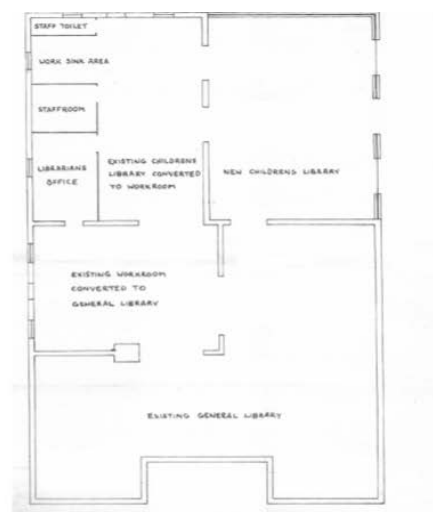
| Existing Library and floor plan (Source: Applicant's EIS 2019)
